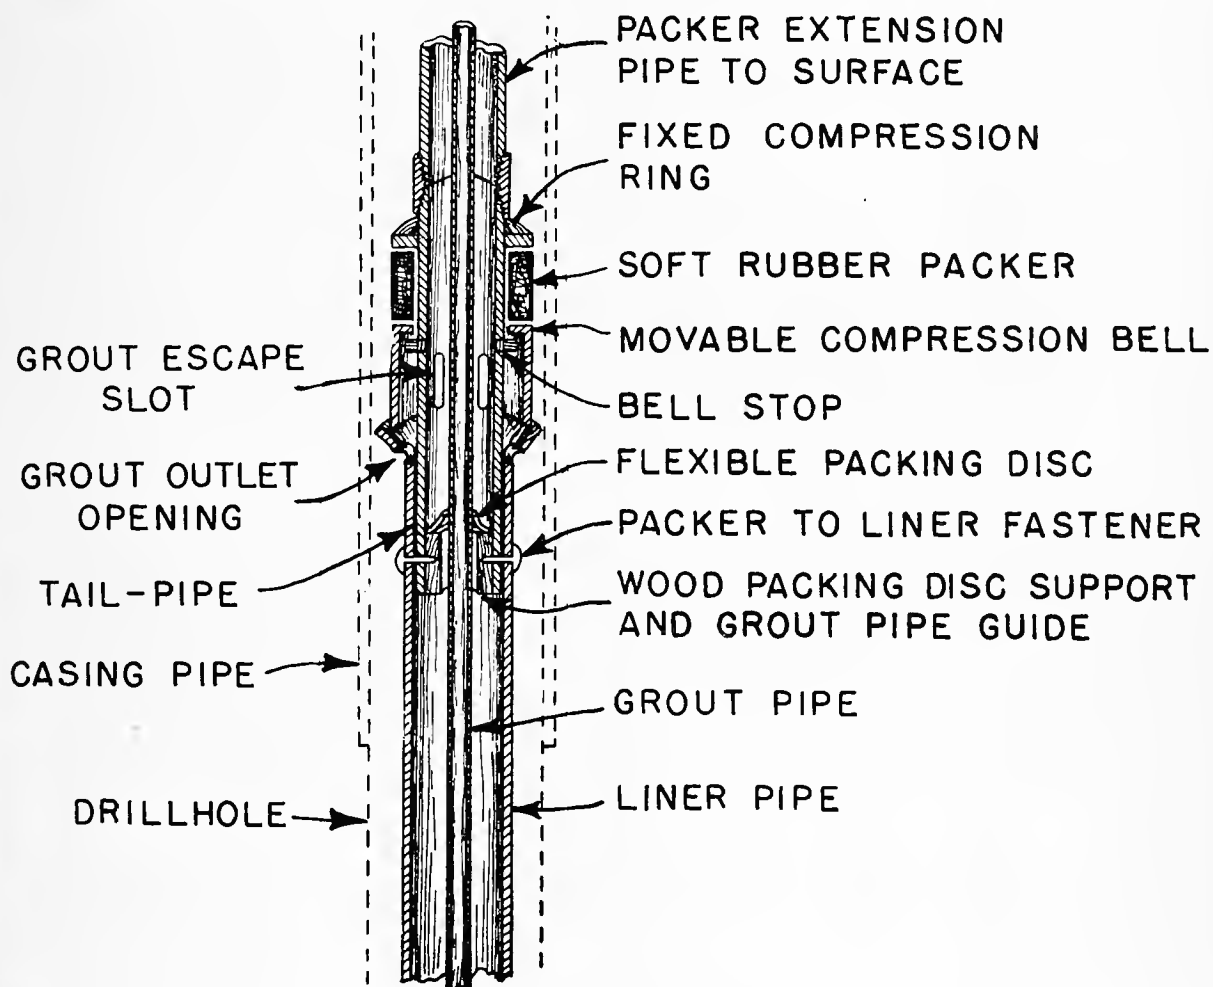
Detail of Packer Assembly for Setting a Heavy Liner Pipe.
